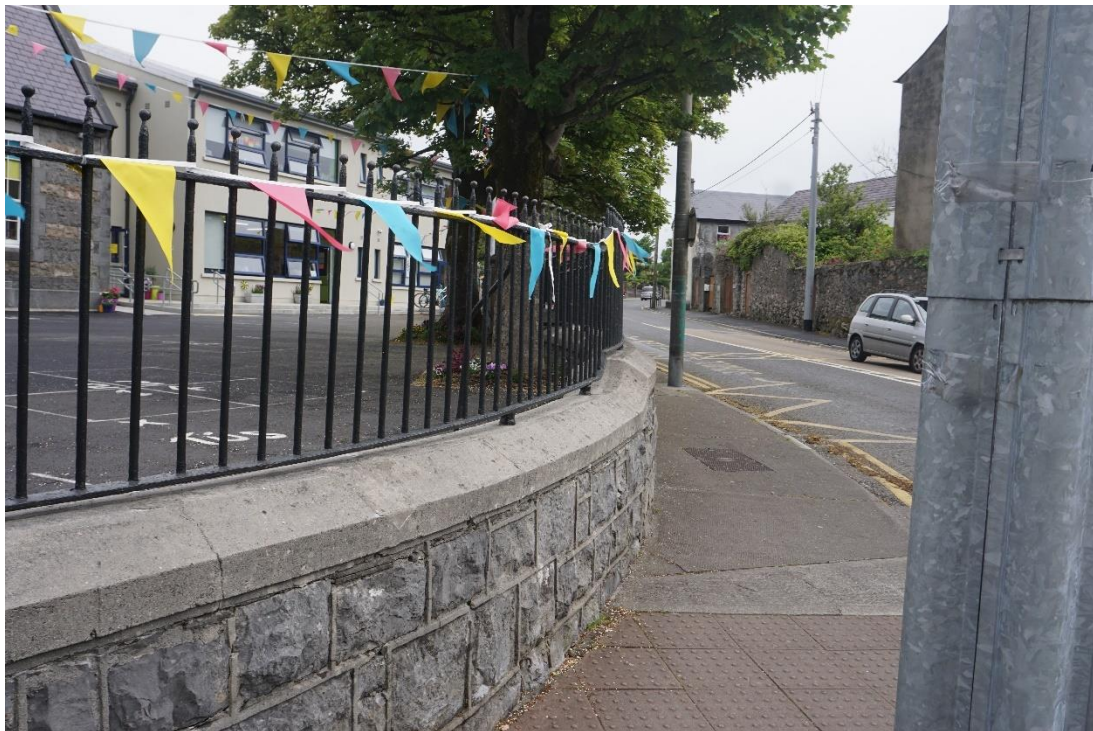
Modern building where the pedestrian plaza area is proposed to be located along
